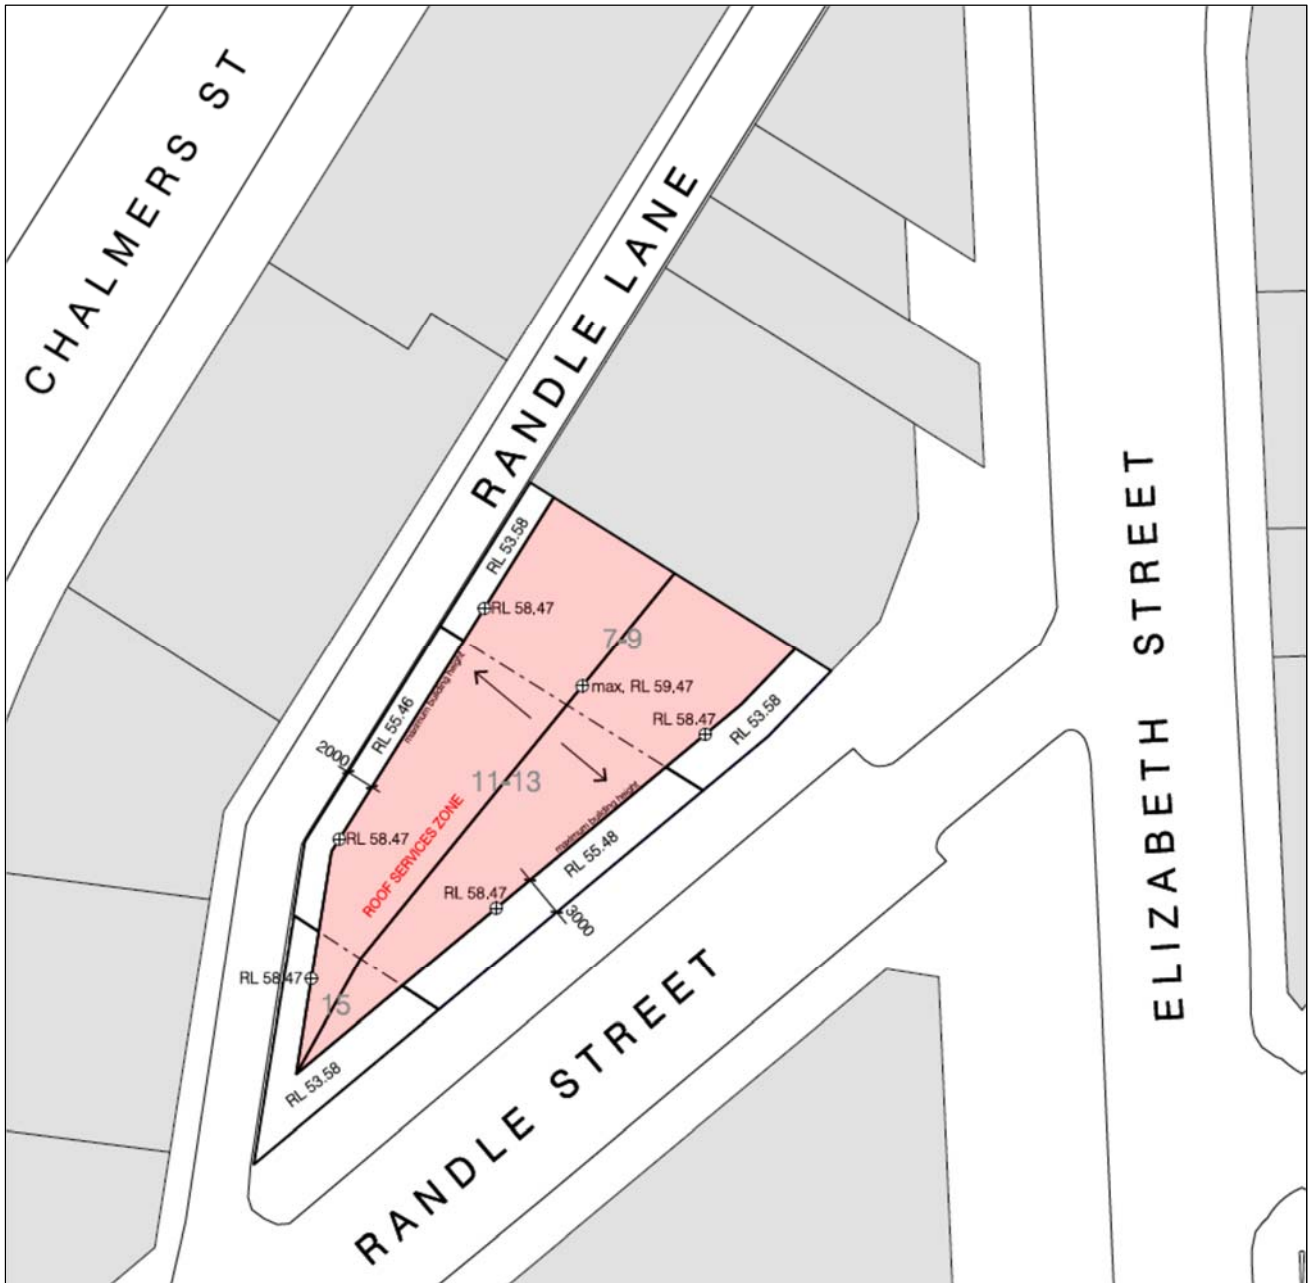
xx: 7-15 Randle Street – Building heights and setbacks
